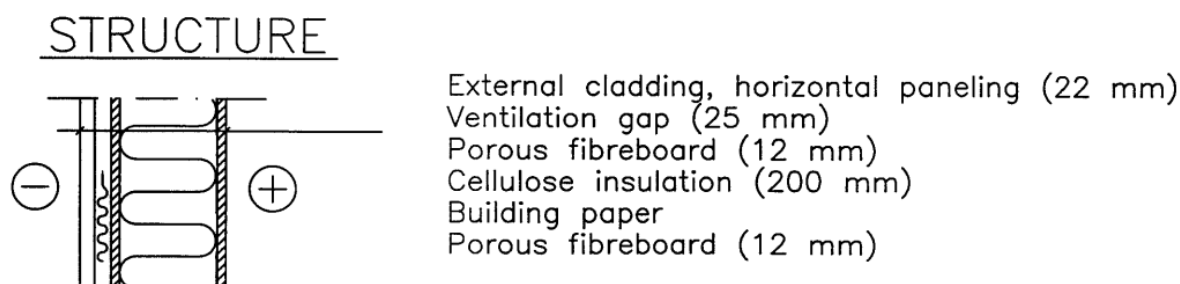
Structure of test wall 8 Copied from Water vapour transmission in wall structures due to diffusion and convection. Publication 103 structural engineering. Vinha, J, Käkelä, P (1999) p. 101
